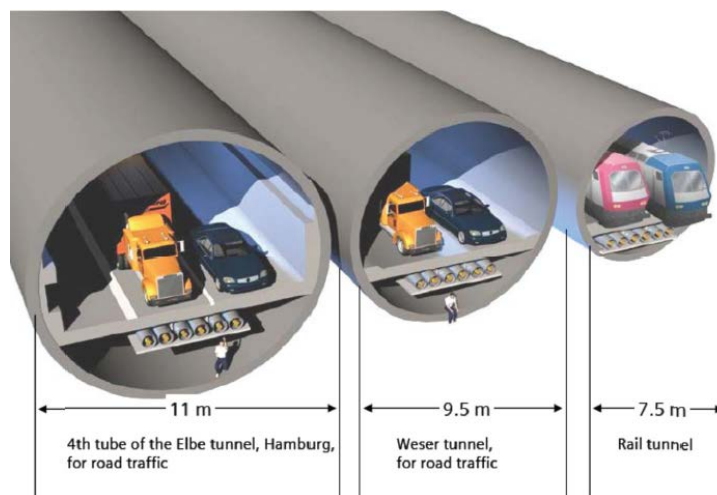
Multipurpose tunnels. Round Tunnels (Data source: [22])
